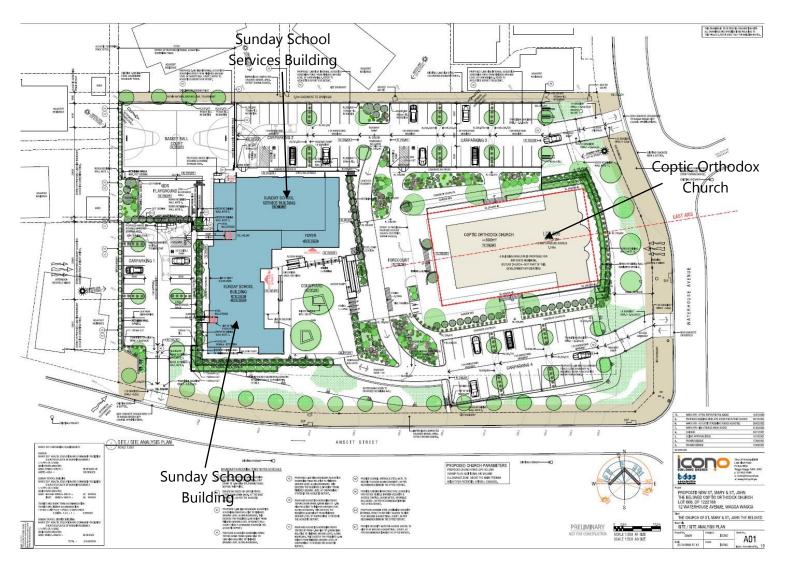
Site / Site Analysis Plan (Source: Icono Building Design)
